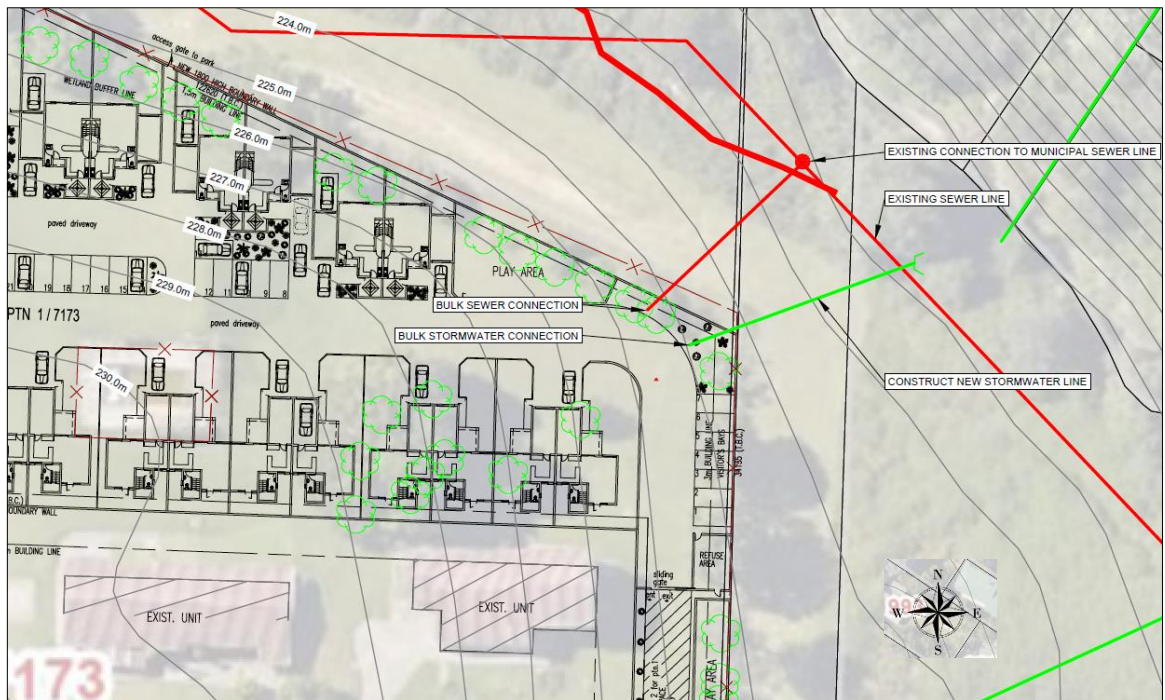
Bulk sewer connection on north-eastern corner of the site.
